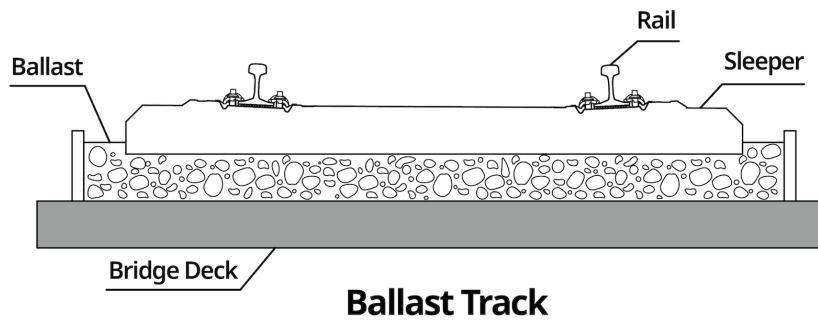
Cross section of a ballast railway bridge track, (Midas, n.d.)
